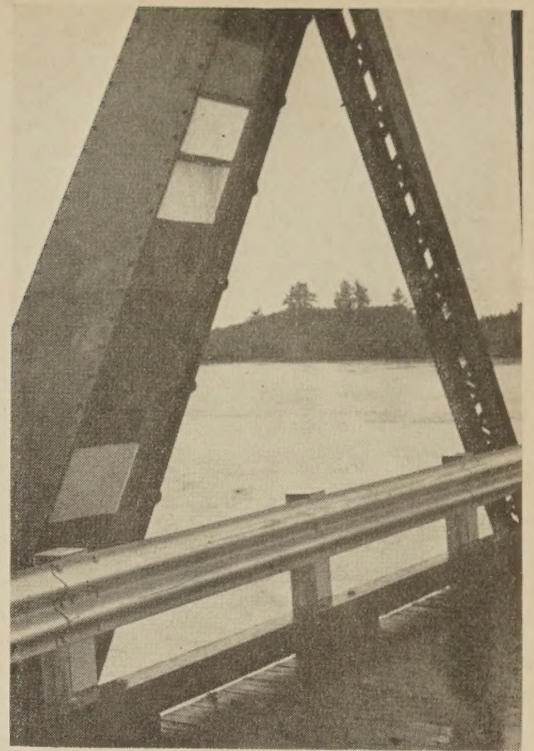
Exposure D at Mile 28 Bridge faced north and subject to erosive forces.
